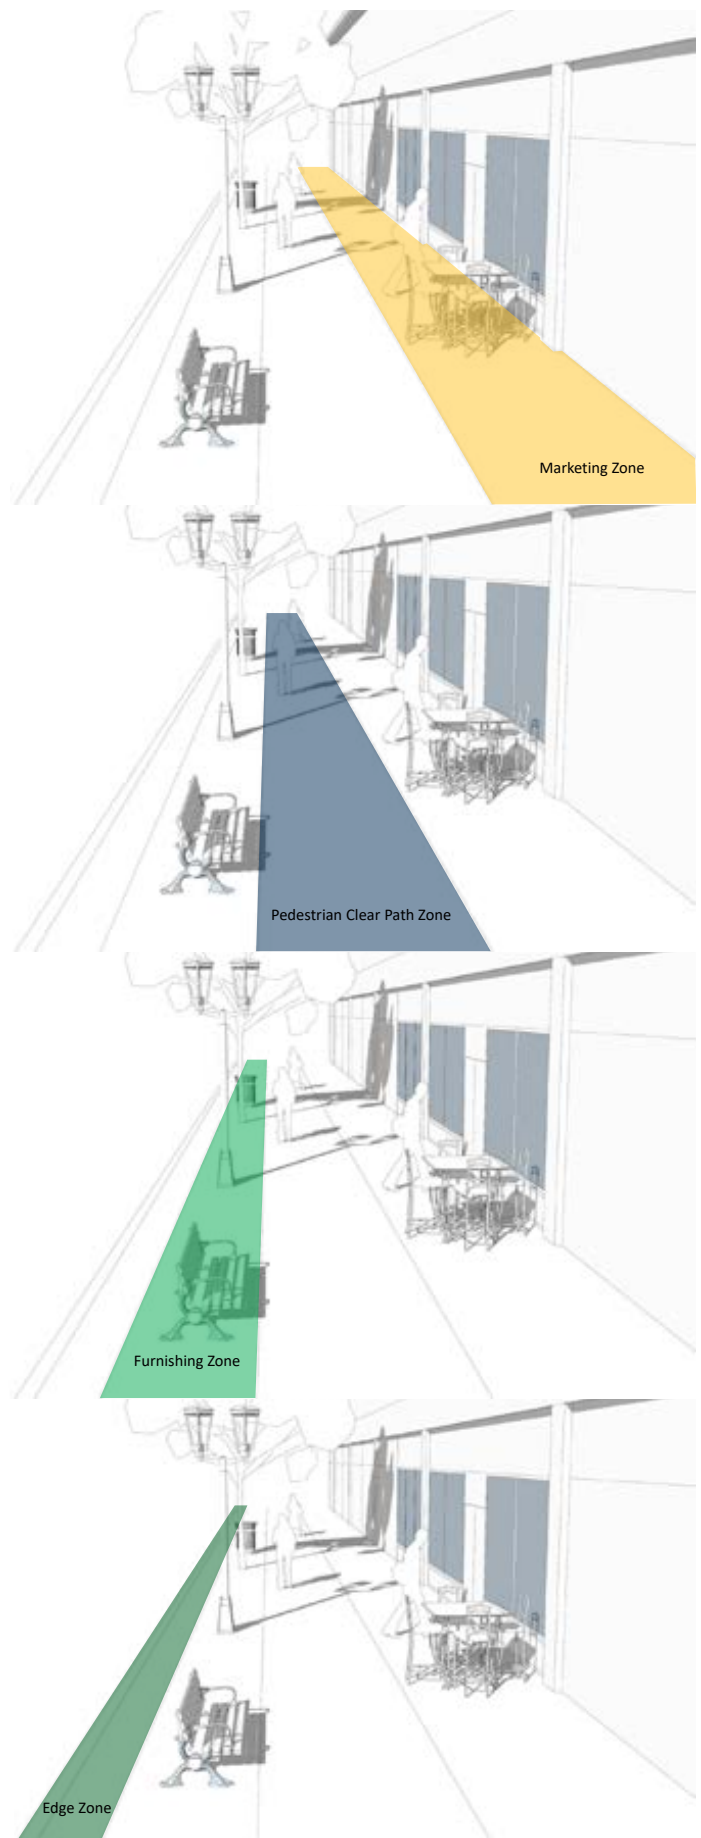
Boulevard zones applied to a portion of Brant Street [east side, looking south of Caroline Street].
